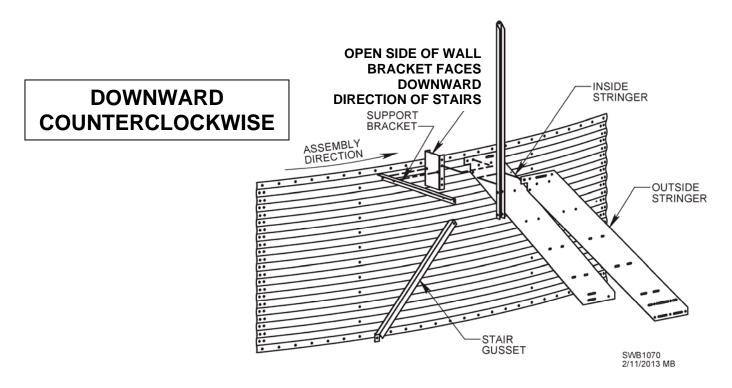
Positioning stringers and brackets when installing stairs downward counterclockwise
